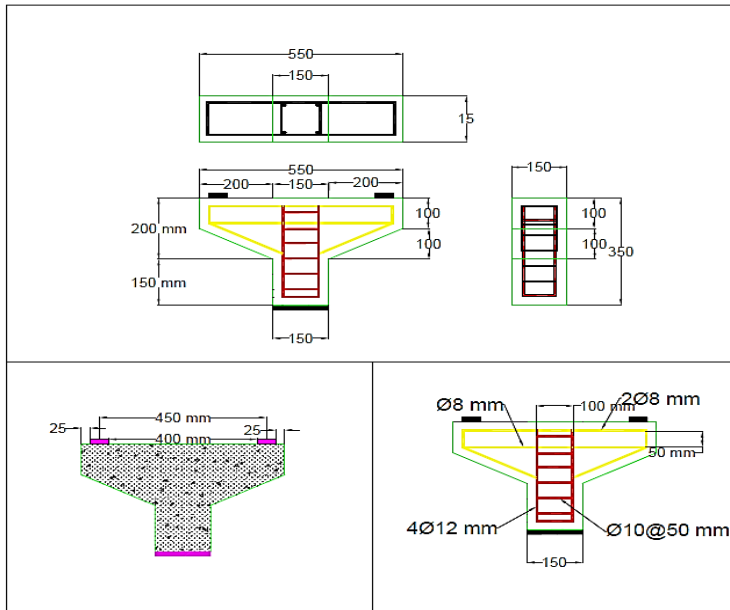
Dimension of bracket and detail of reinforcement steel bars
